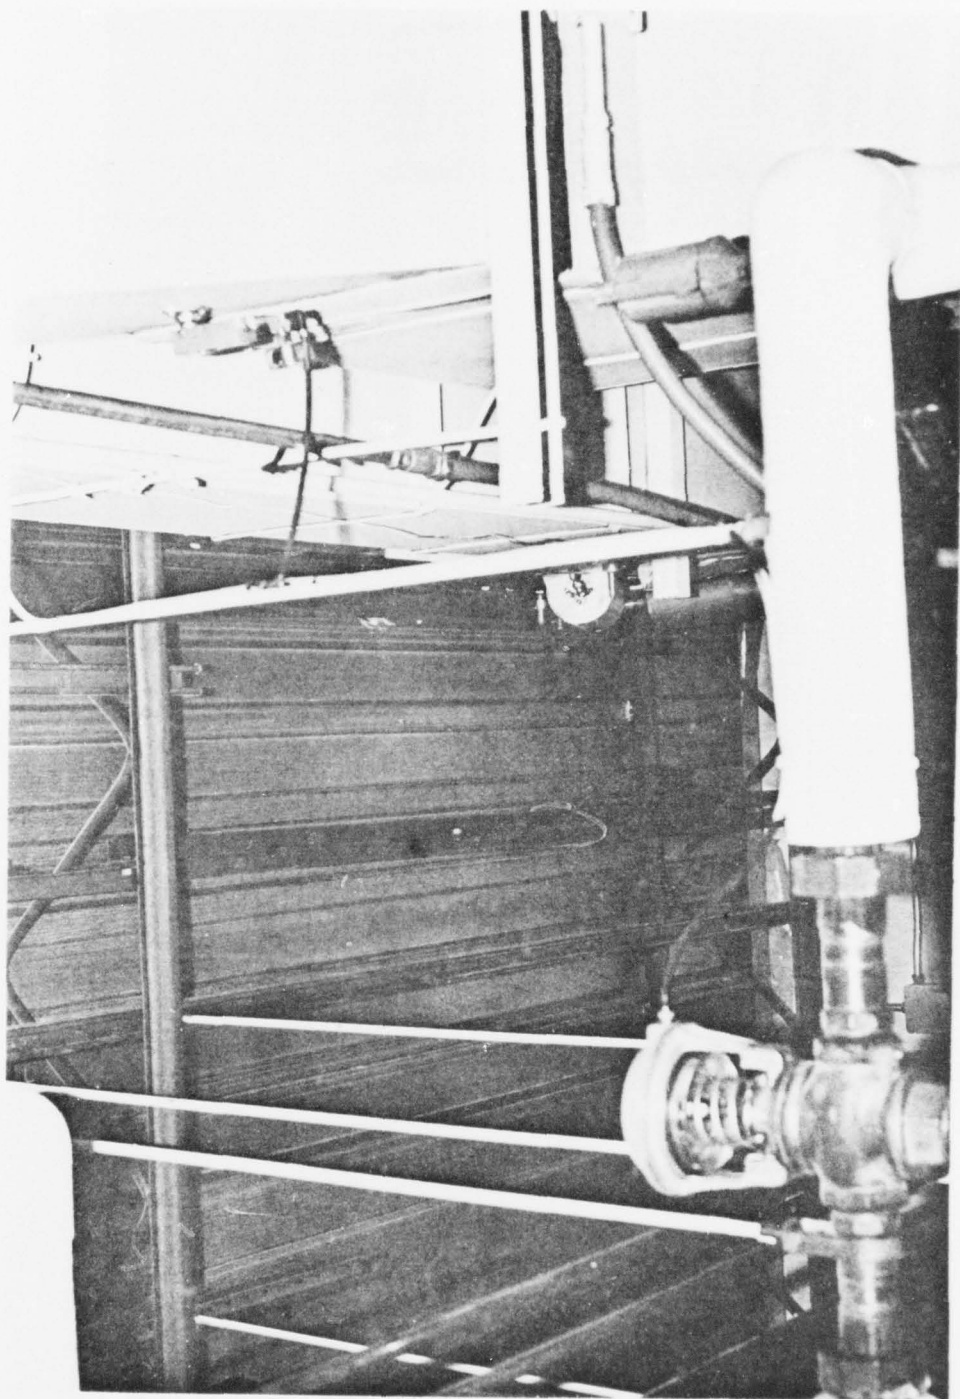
Underside of Roof Deck in Furnace Room, 7 April 1978.
